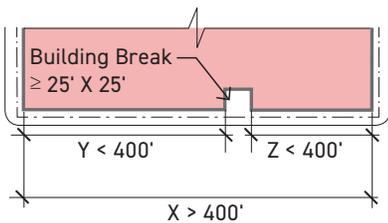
FLOOR PLATE AREA AND MAXIMUM PLAN LENGTH
